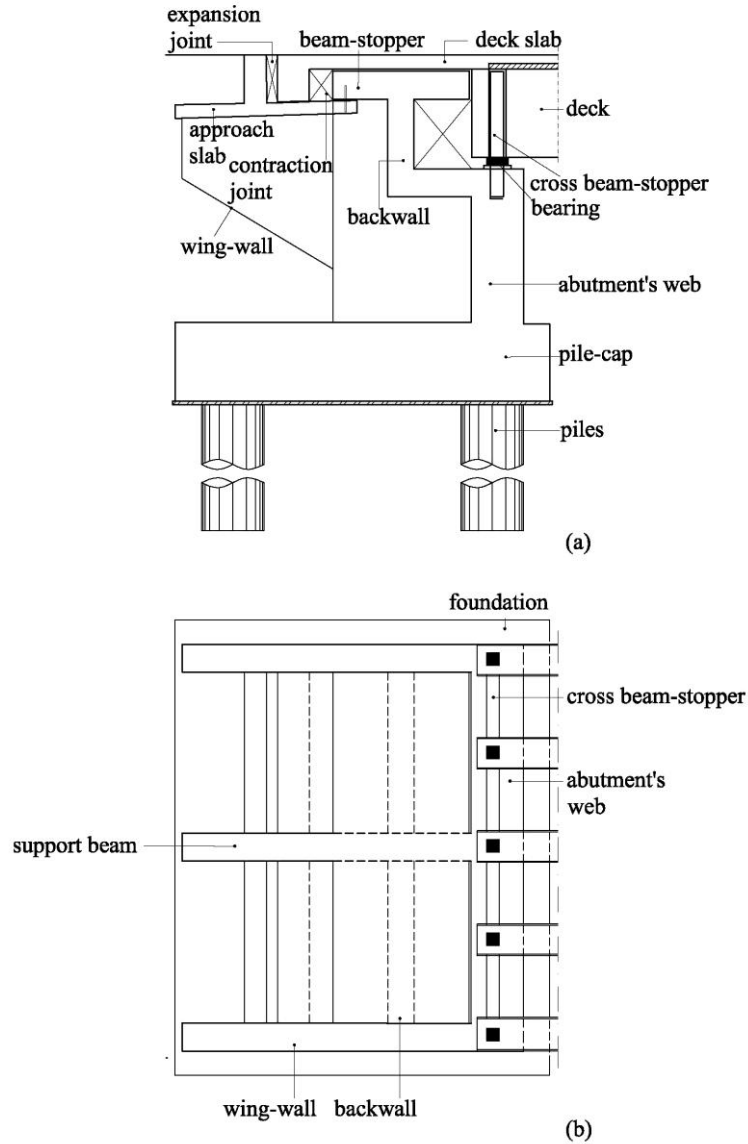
(a) Longitudinal section and (b) plan view of the proposed external stopper
